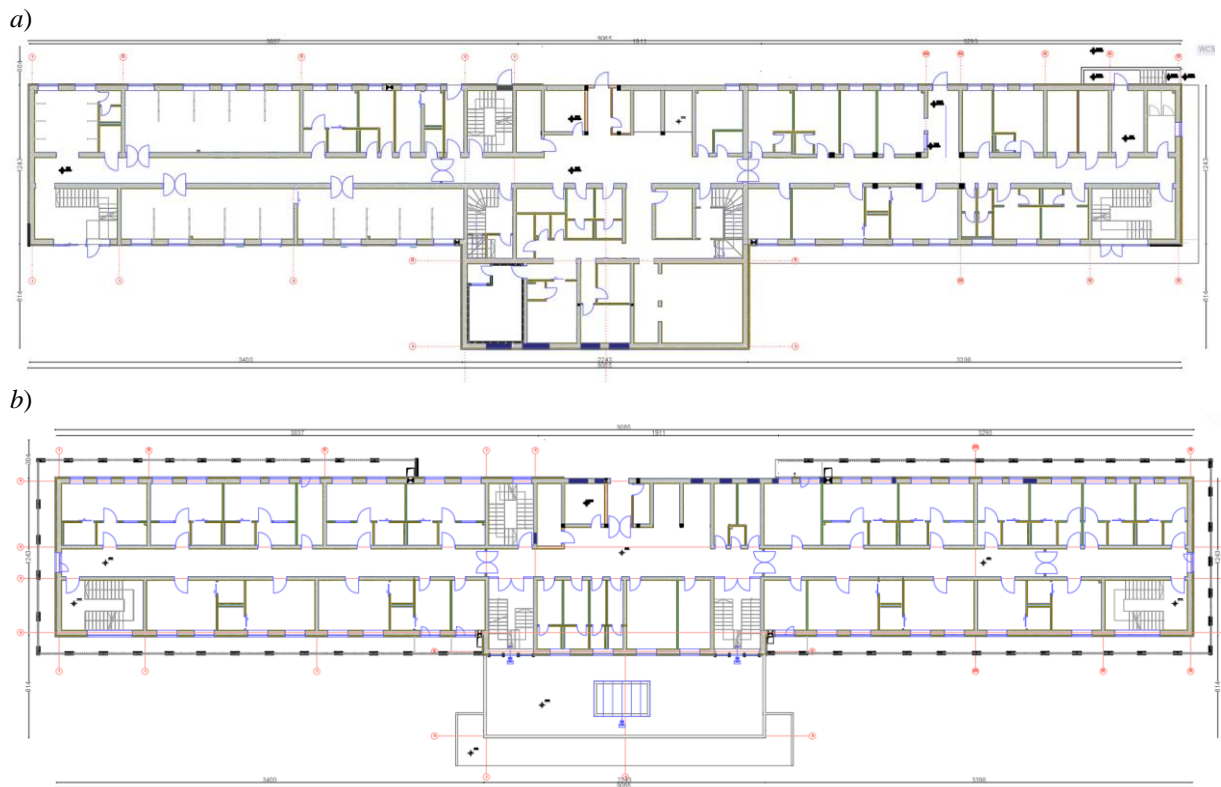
Design of renovated building: a) Basement story, ground story; b) First story, second story.
